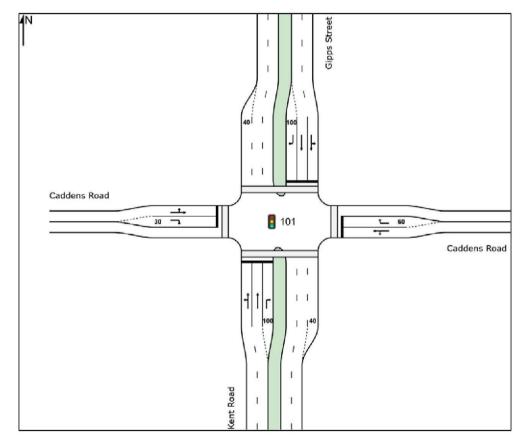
Signalised intersection of Gipps Street and Kent Road with Caddens Road (SIDRA)
